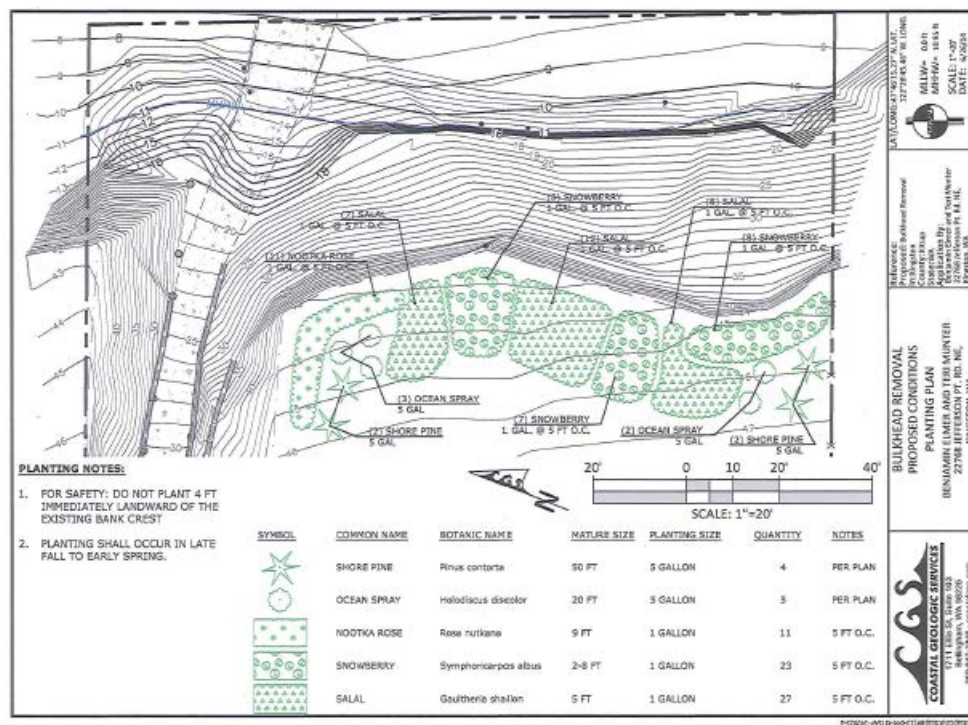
PLANTING PLAN FOR THE TOP OF SLOPE BUFFER AREA.
